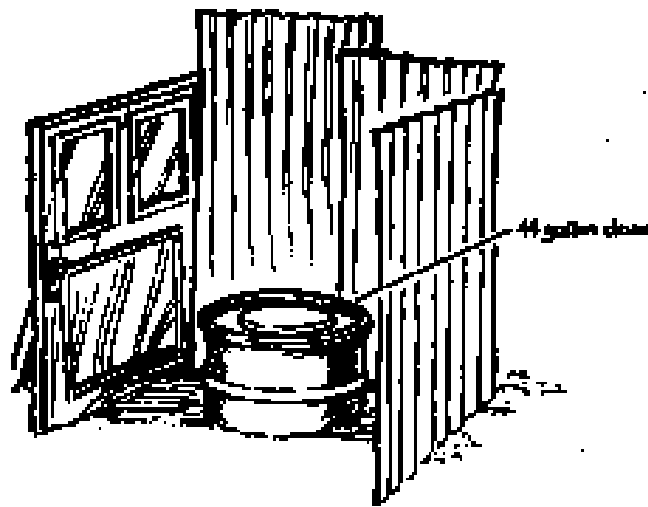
Dry drop-hole toilet with roughly constructed seat and walls.
